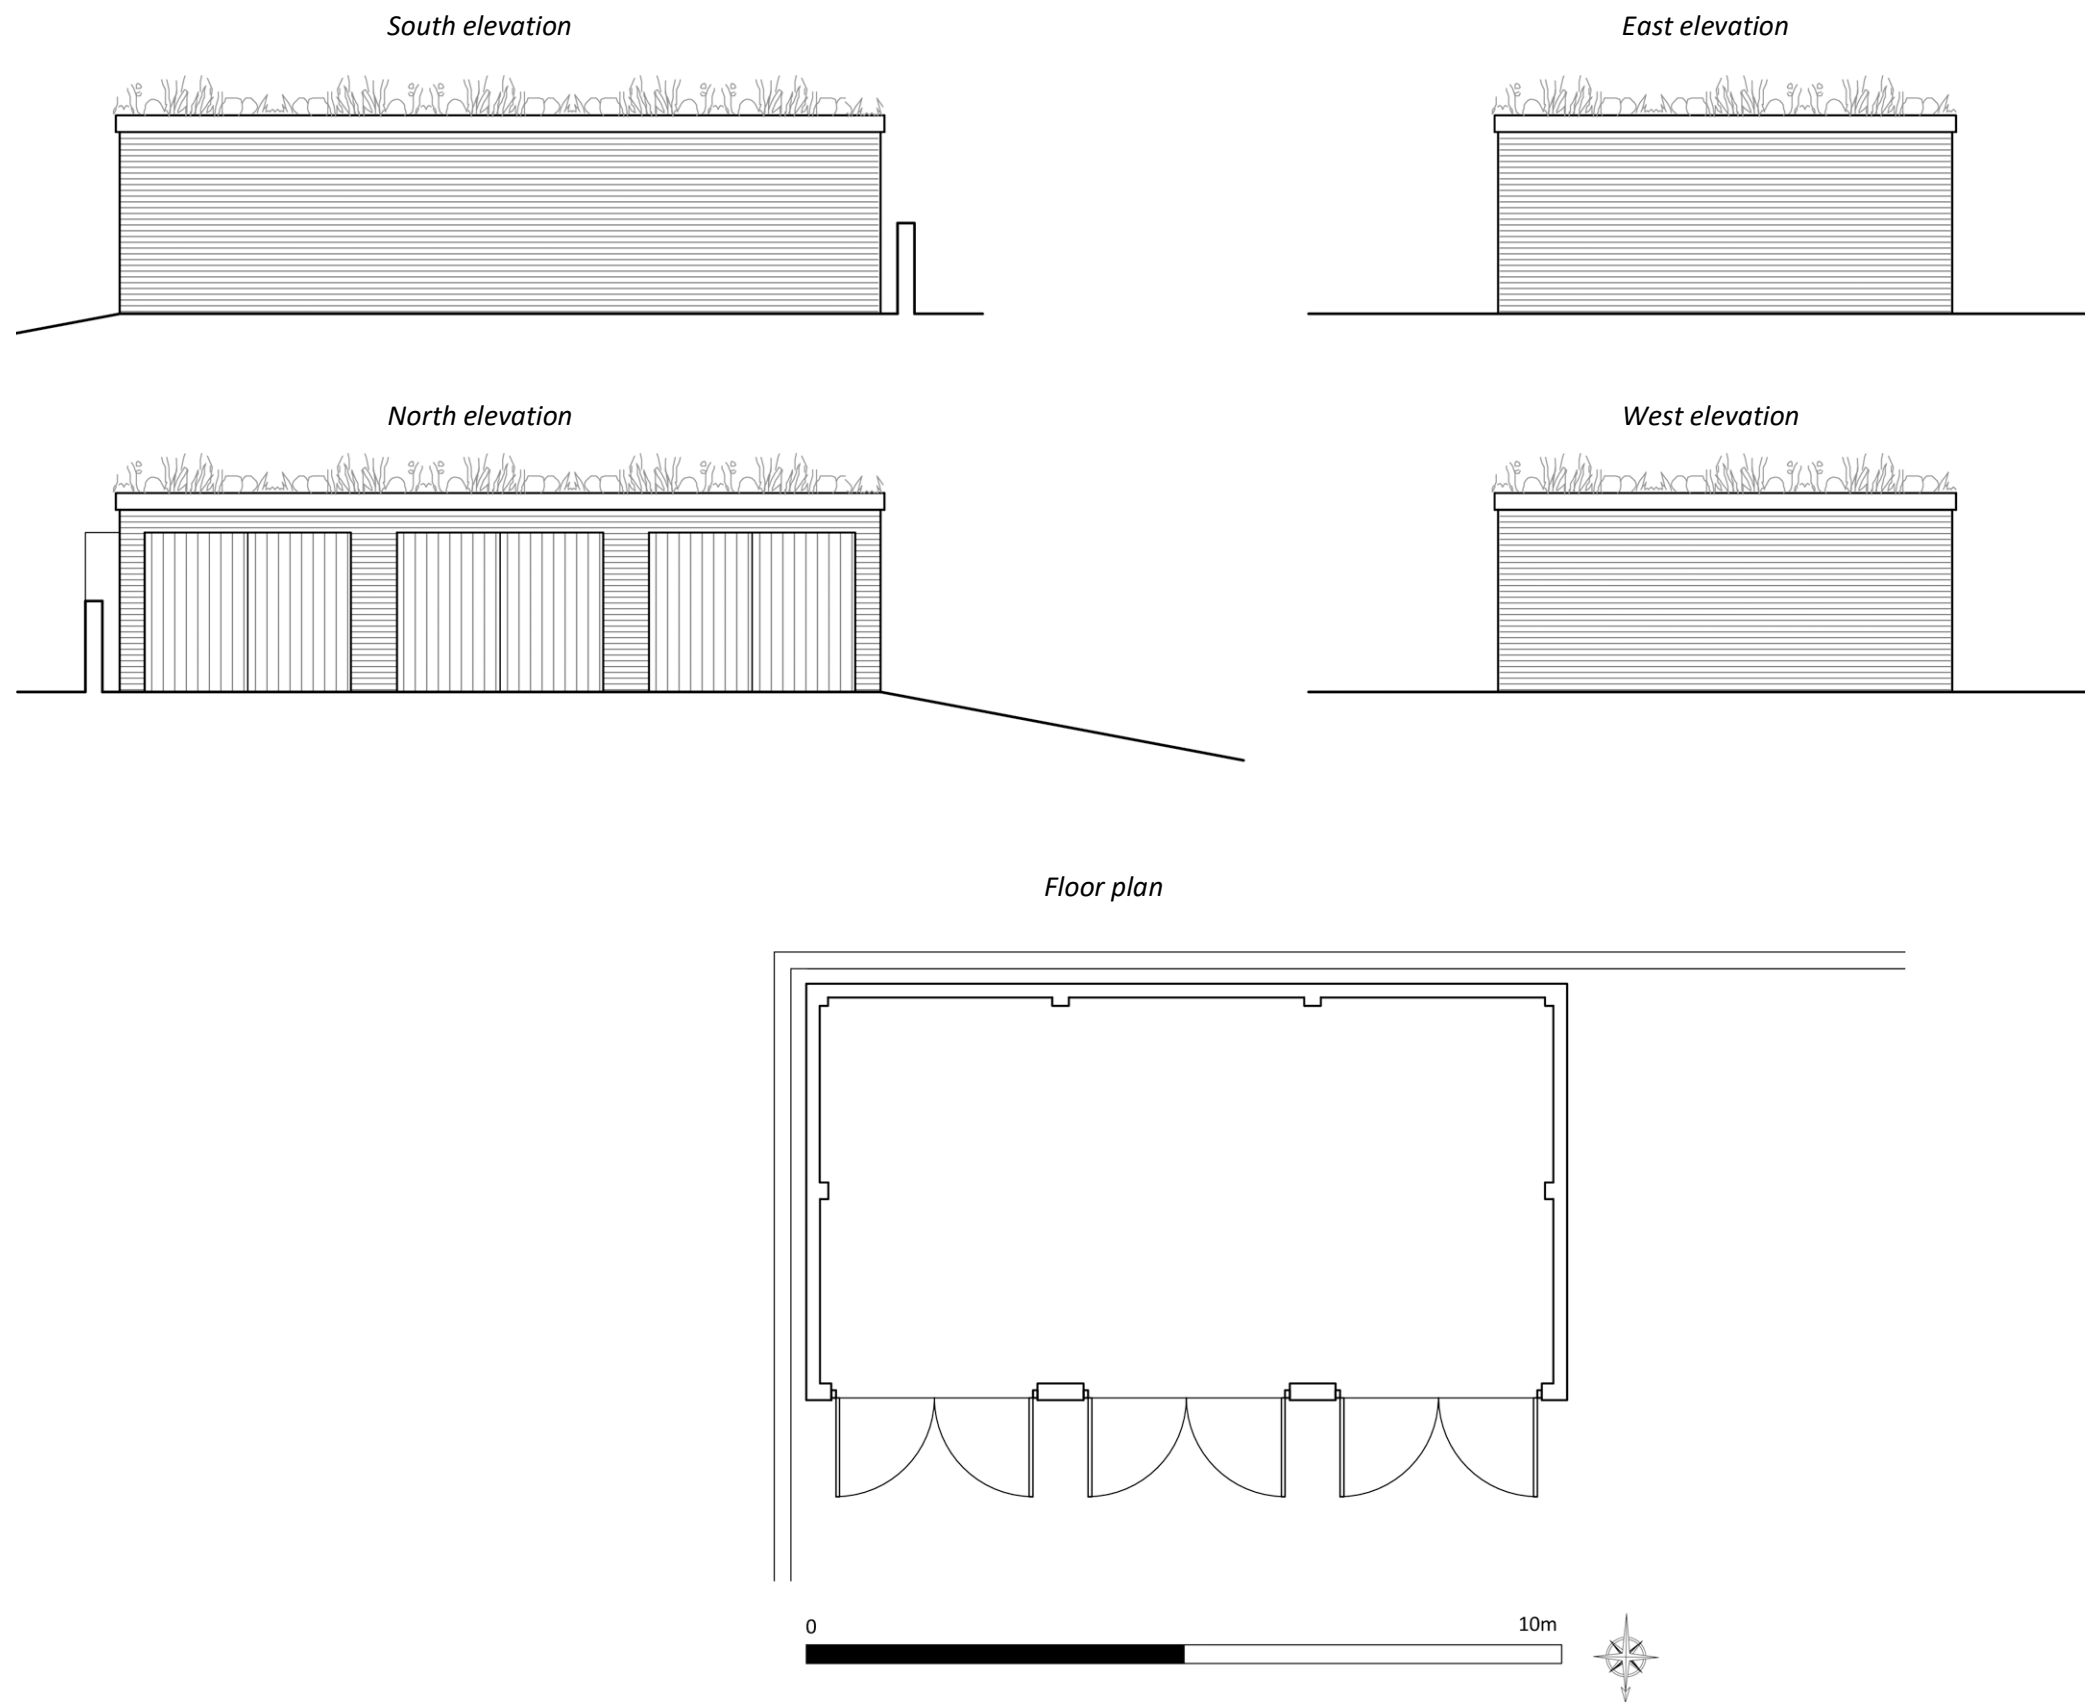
Proposed new garage to Barn 1 (scale 1:100)
